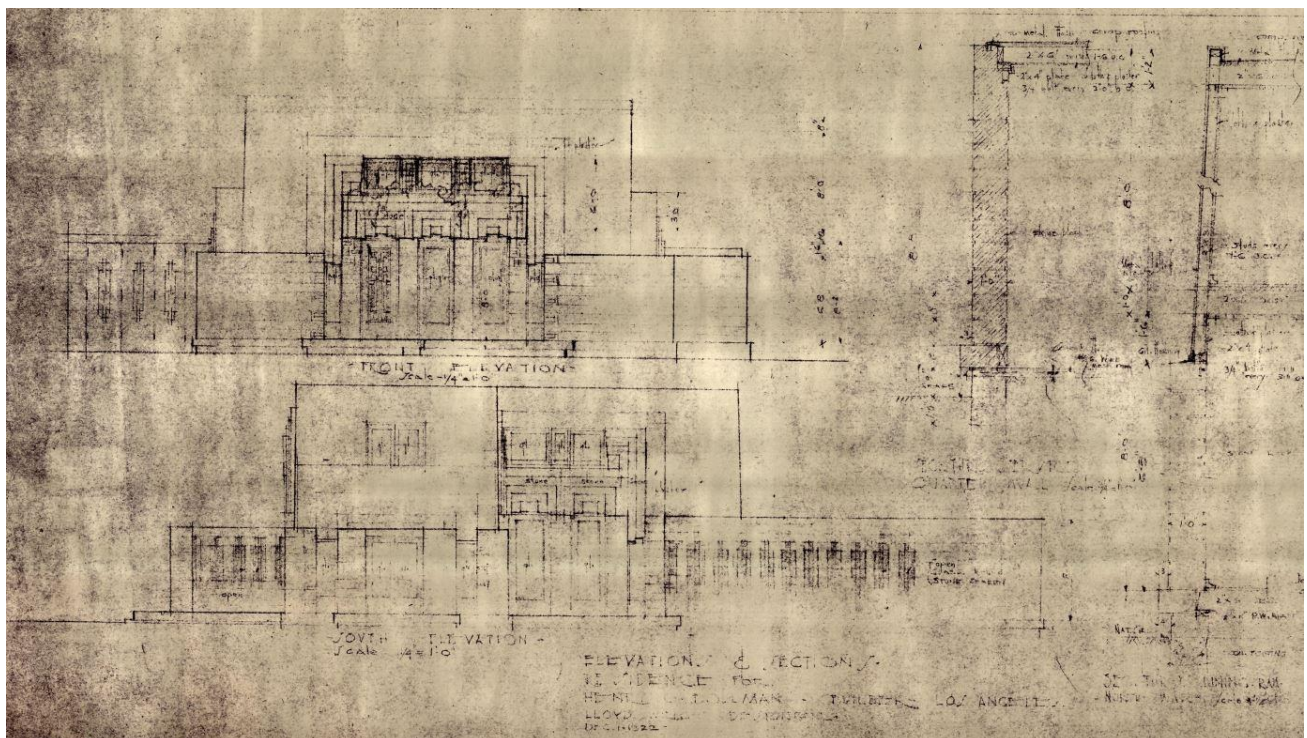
The west elevation (top) and south elevation (bottom) of the Henry Bollman House, 1922.
